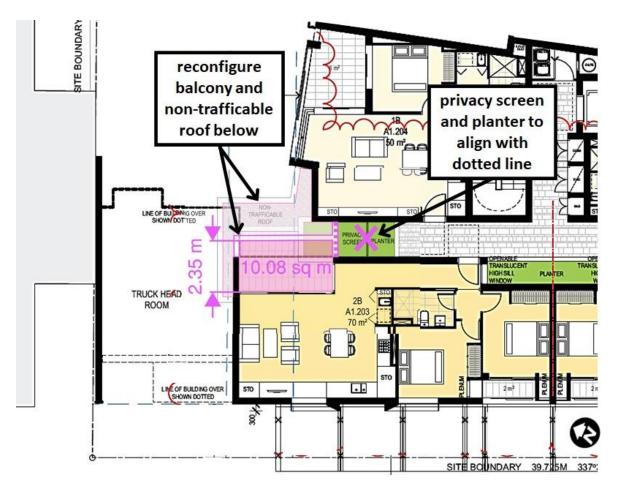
Conditions are recommended for design modifications to the balcony of apartment A1.203 and the nearby corridor to improve privacy and to improve maintenance access to the corridor planter
